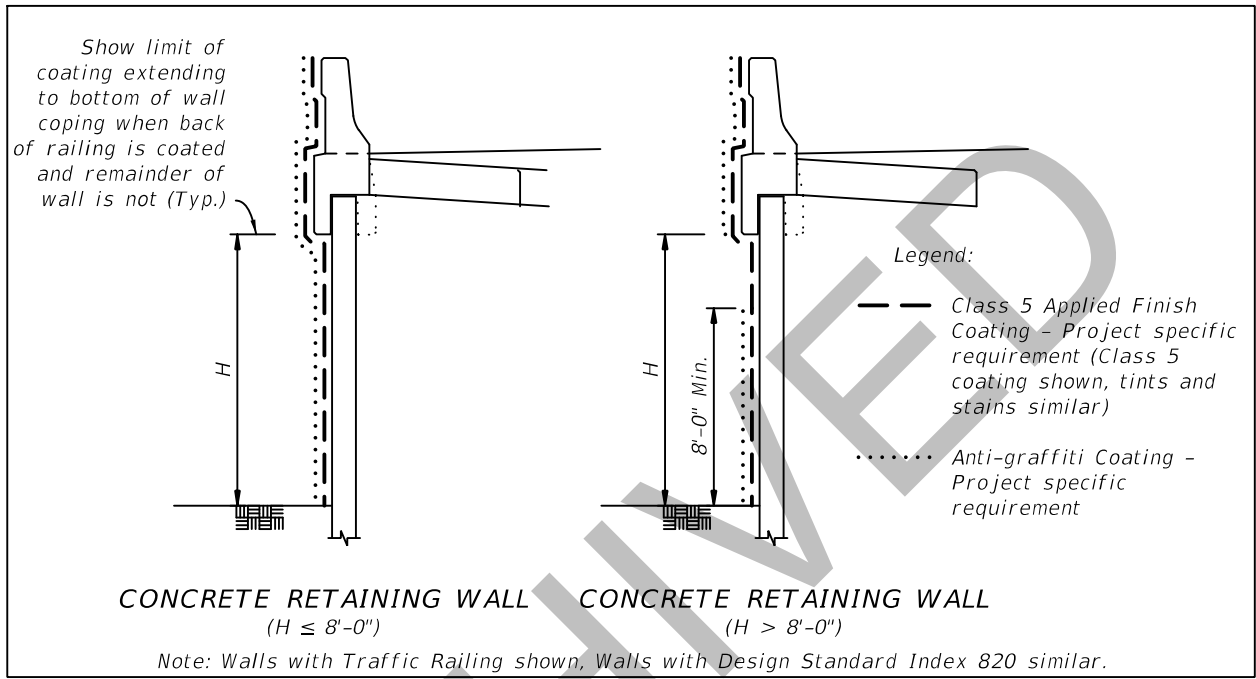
Example Surface Finish Depictions on Retaining Walls with Traffic Railings or Parapets
